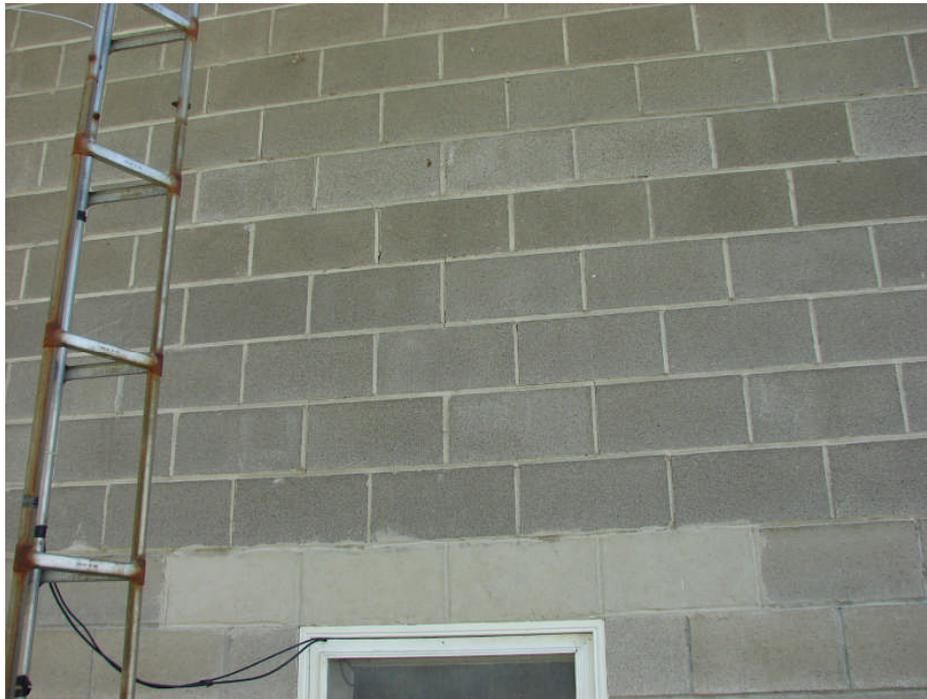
Residence north elevation – Basement and main floor concrete block step cracking, typical.
